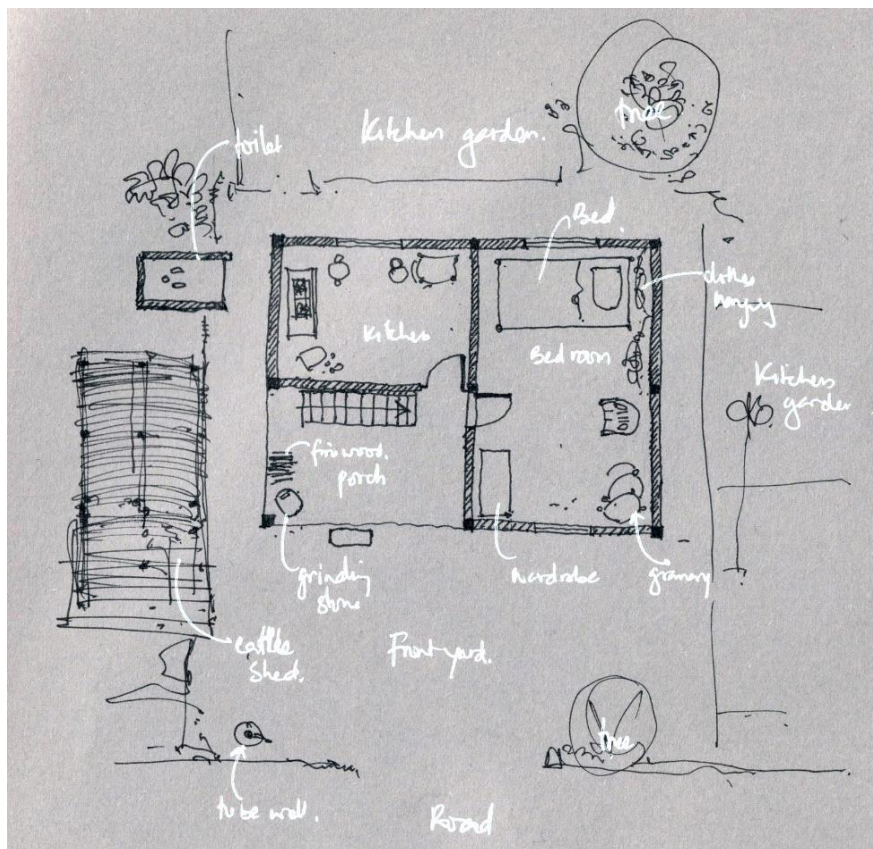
An *ek dine ghar* with brick masonry wall laid out in its site surrounding at the Bhutaha Tole. – sketch by the author.
